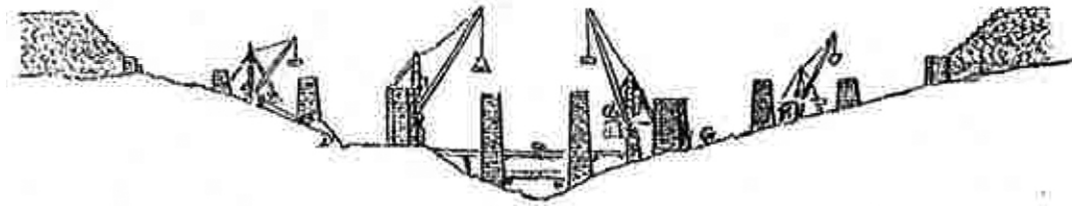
Elevation and plan of the viaduct of Atauri (left) (Mendizábal, 1926)
